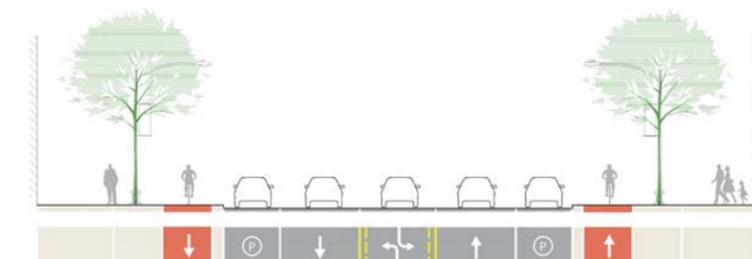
11th Street typical section San Jacinto Boulevard to Colorado Street
